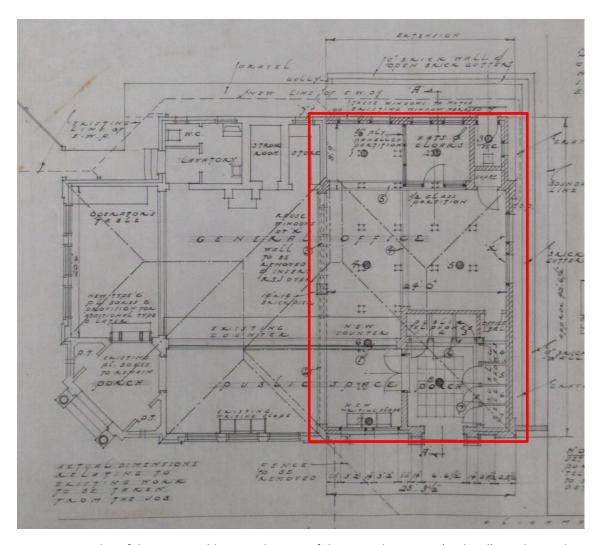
Plan of the c. 1934 addition to the west of the original structure (outlined); north is to the bottom of the image
